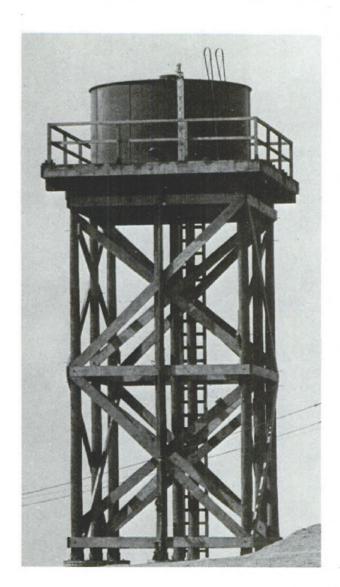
A 250-barrel steel water tank on a 35-foot tower.
